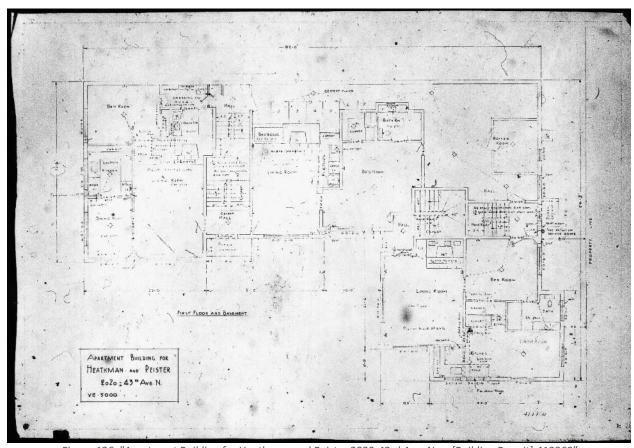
"Apartment Building for Heathman and Peister 2020-43rd Ave. N. ... [Building Permit] 412969"
